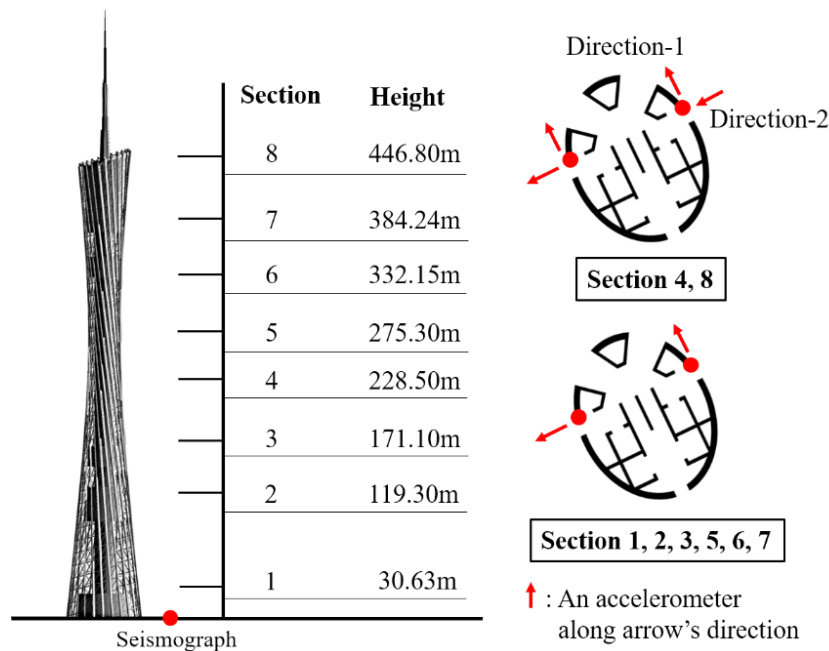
Accelerometer layout of Canton Tower SHM system
